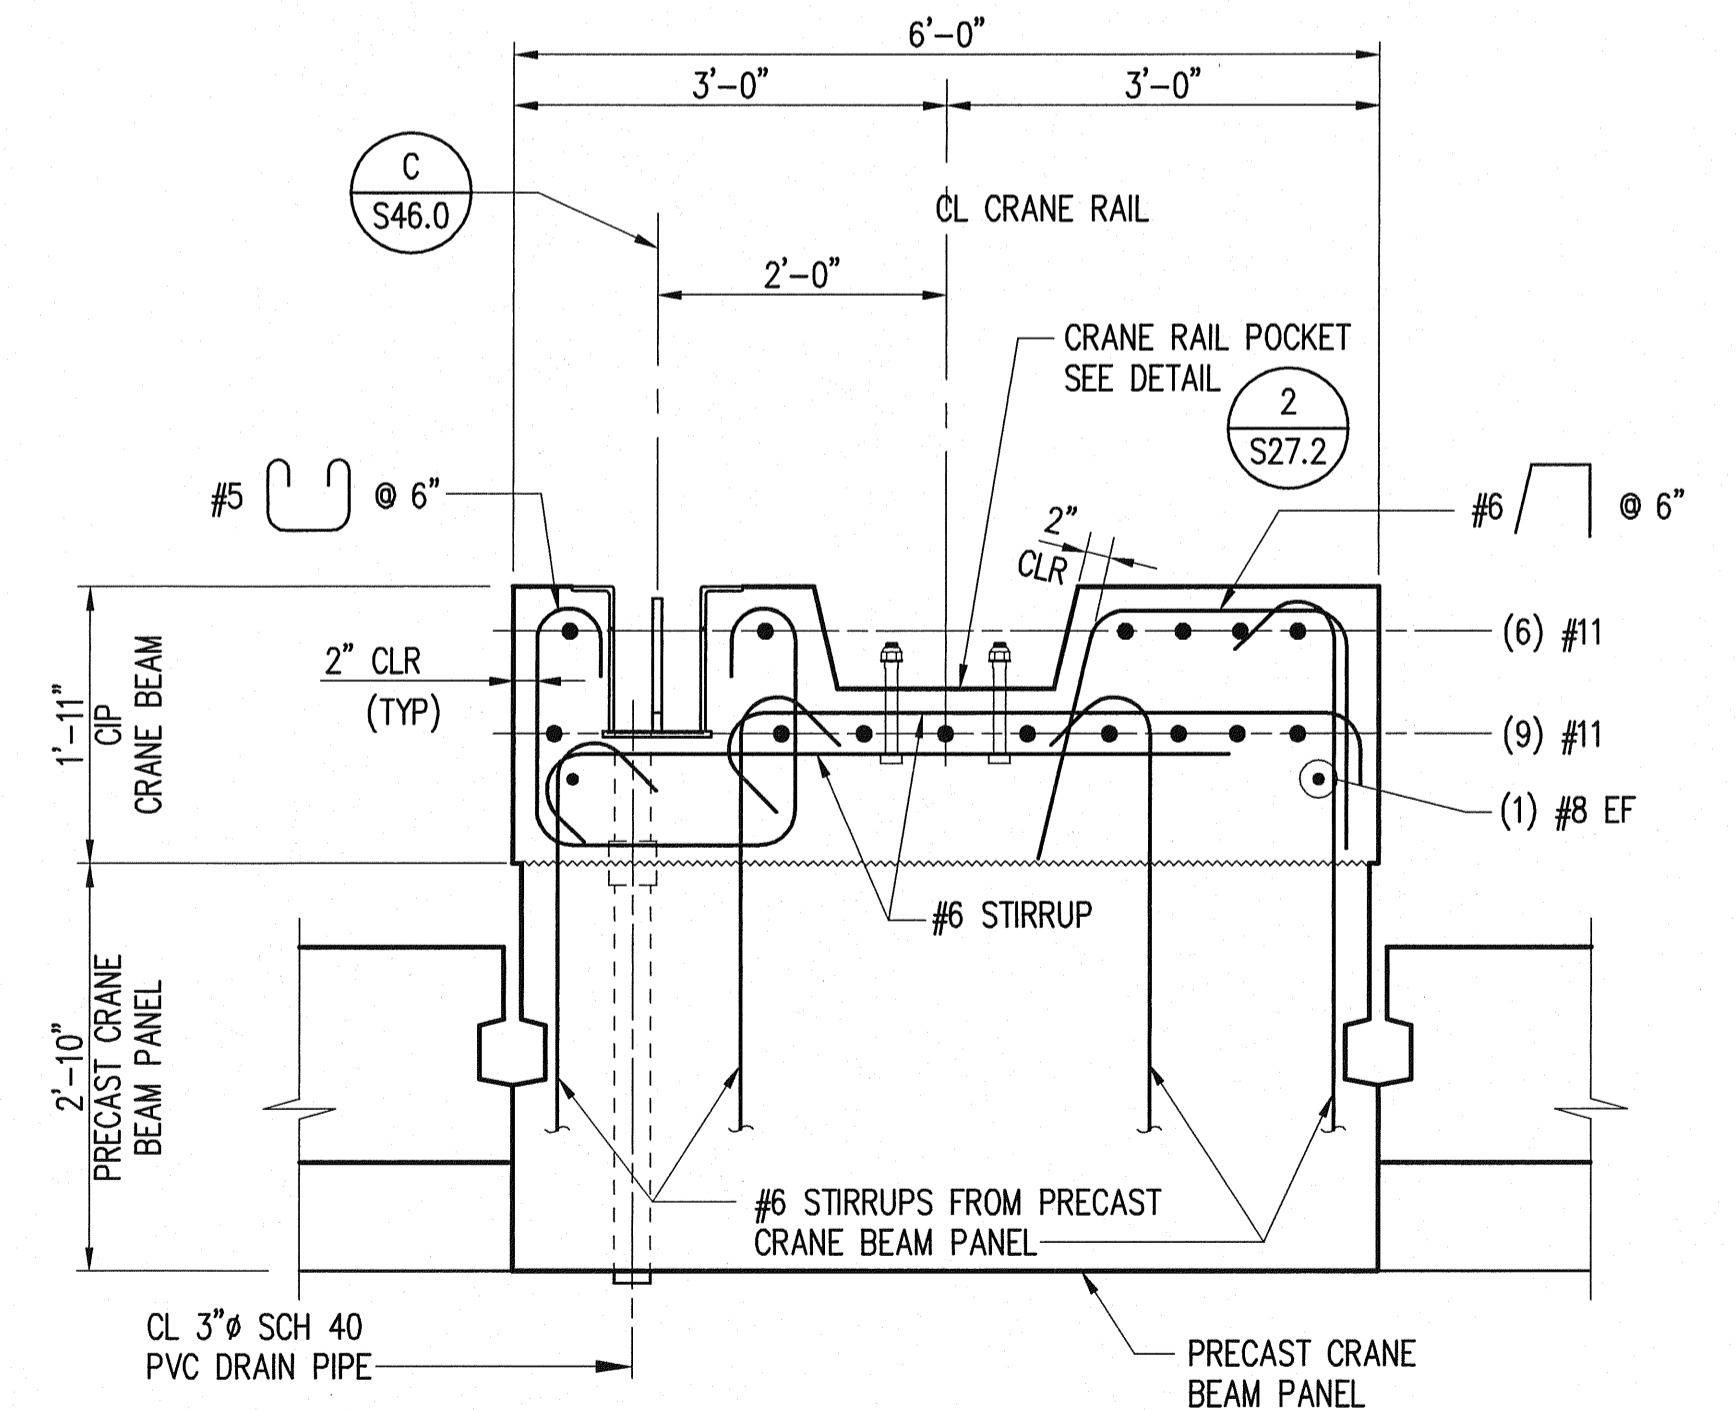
DETAIL - NORTH END OUTBOARD CRANE BEAM STOP
